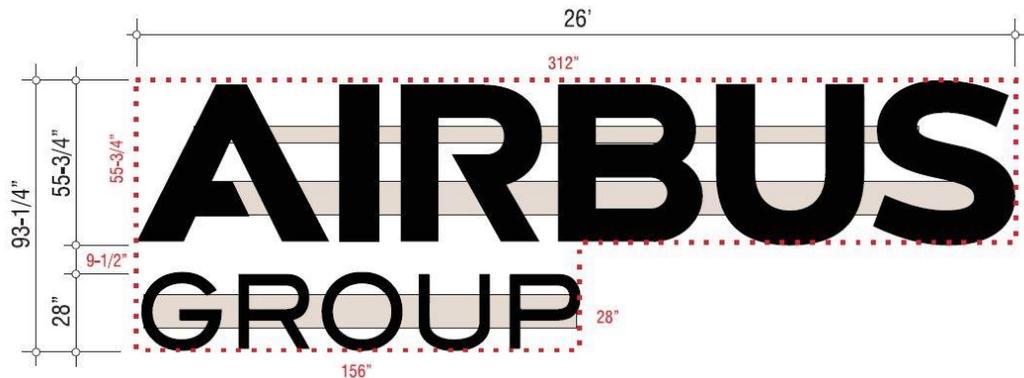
Proposed new sign (from Sheet 7A of the CSPA).
